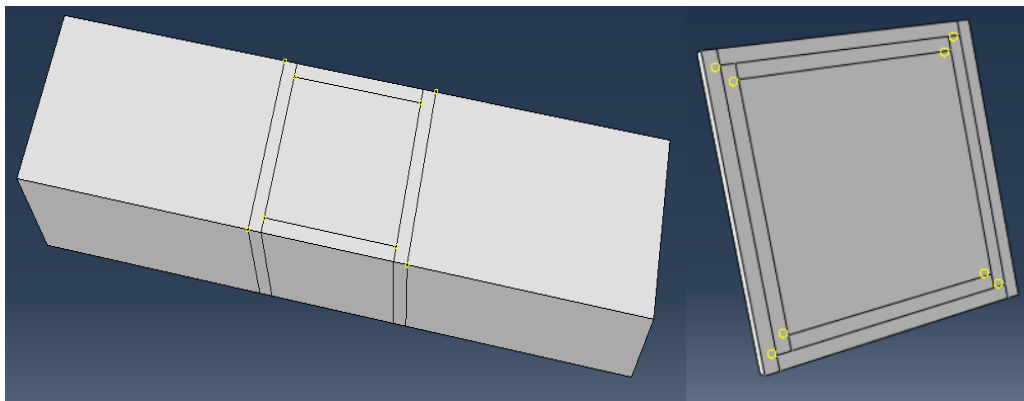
Foundation and steel plate modelled in ABAQUS.
